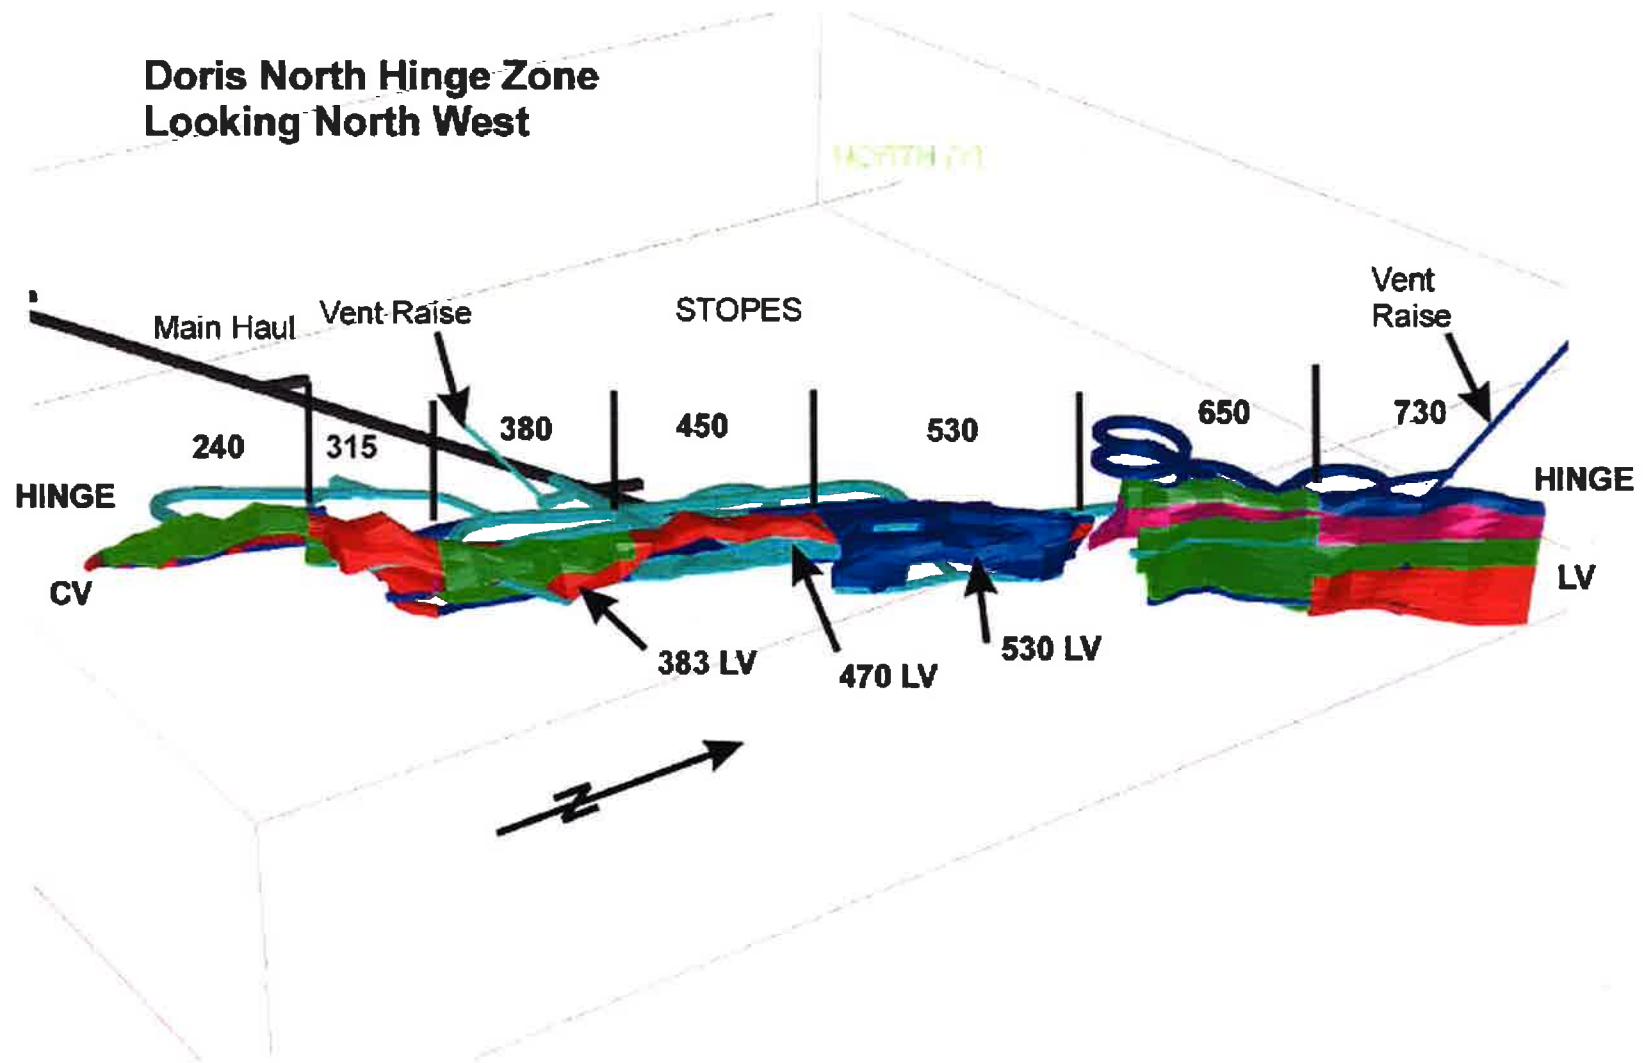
Doris Hinge Zone Mine Design Looking North West
